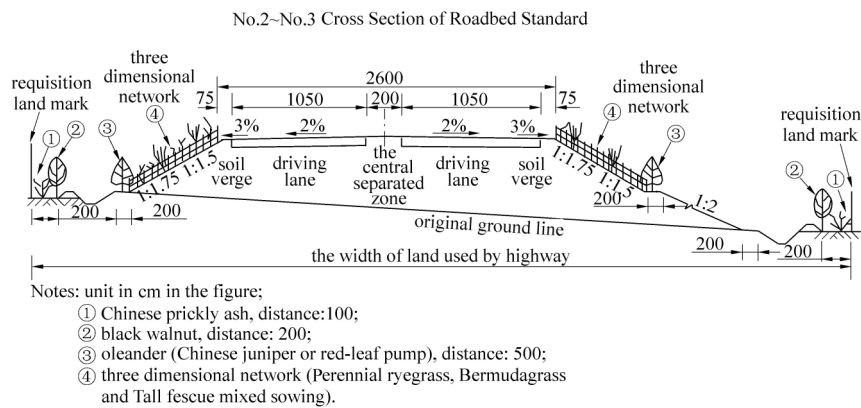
Cross section of biological protection design on the side slope of No. 2—3 roadbed in Luoyang section
